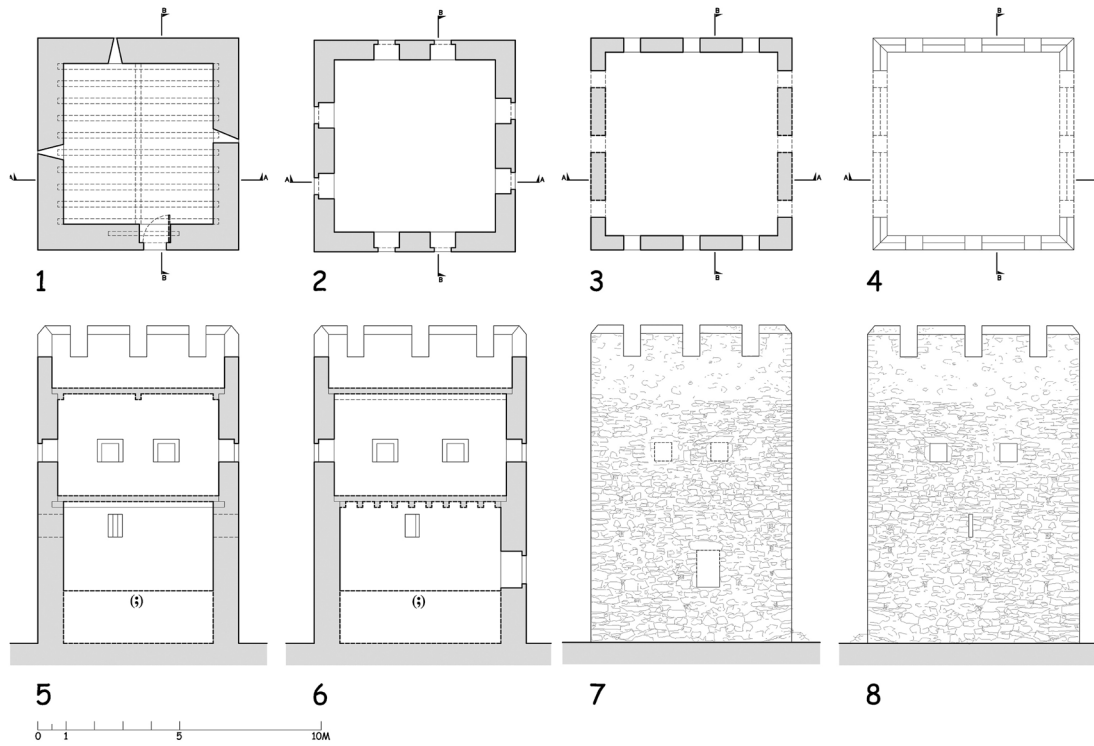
Rizokastro, castle. Tower, reconstruction: 1) plan 1, 2) plan 2, 3) plan 3, 4) plan 4, 5) section AA, 6) section BB, 7) east elevation, 8) north elevation.
